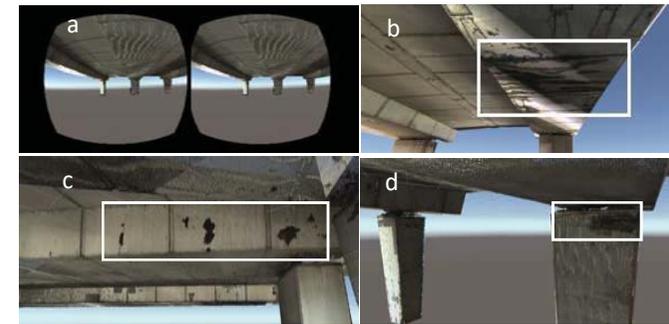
Bridge inspection in the VR. Features shown are: a) stereoscopic view; b) spalling on girders; c) thermal cracks on the beams; d) spalling in piers
